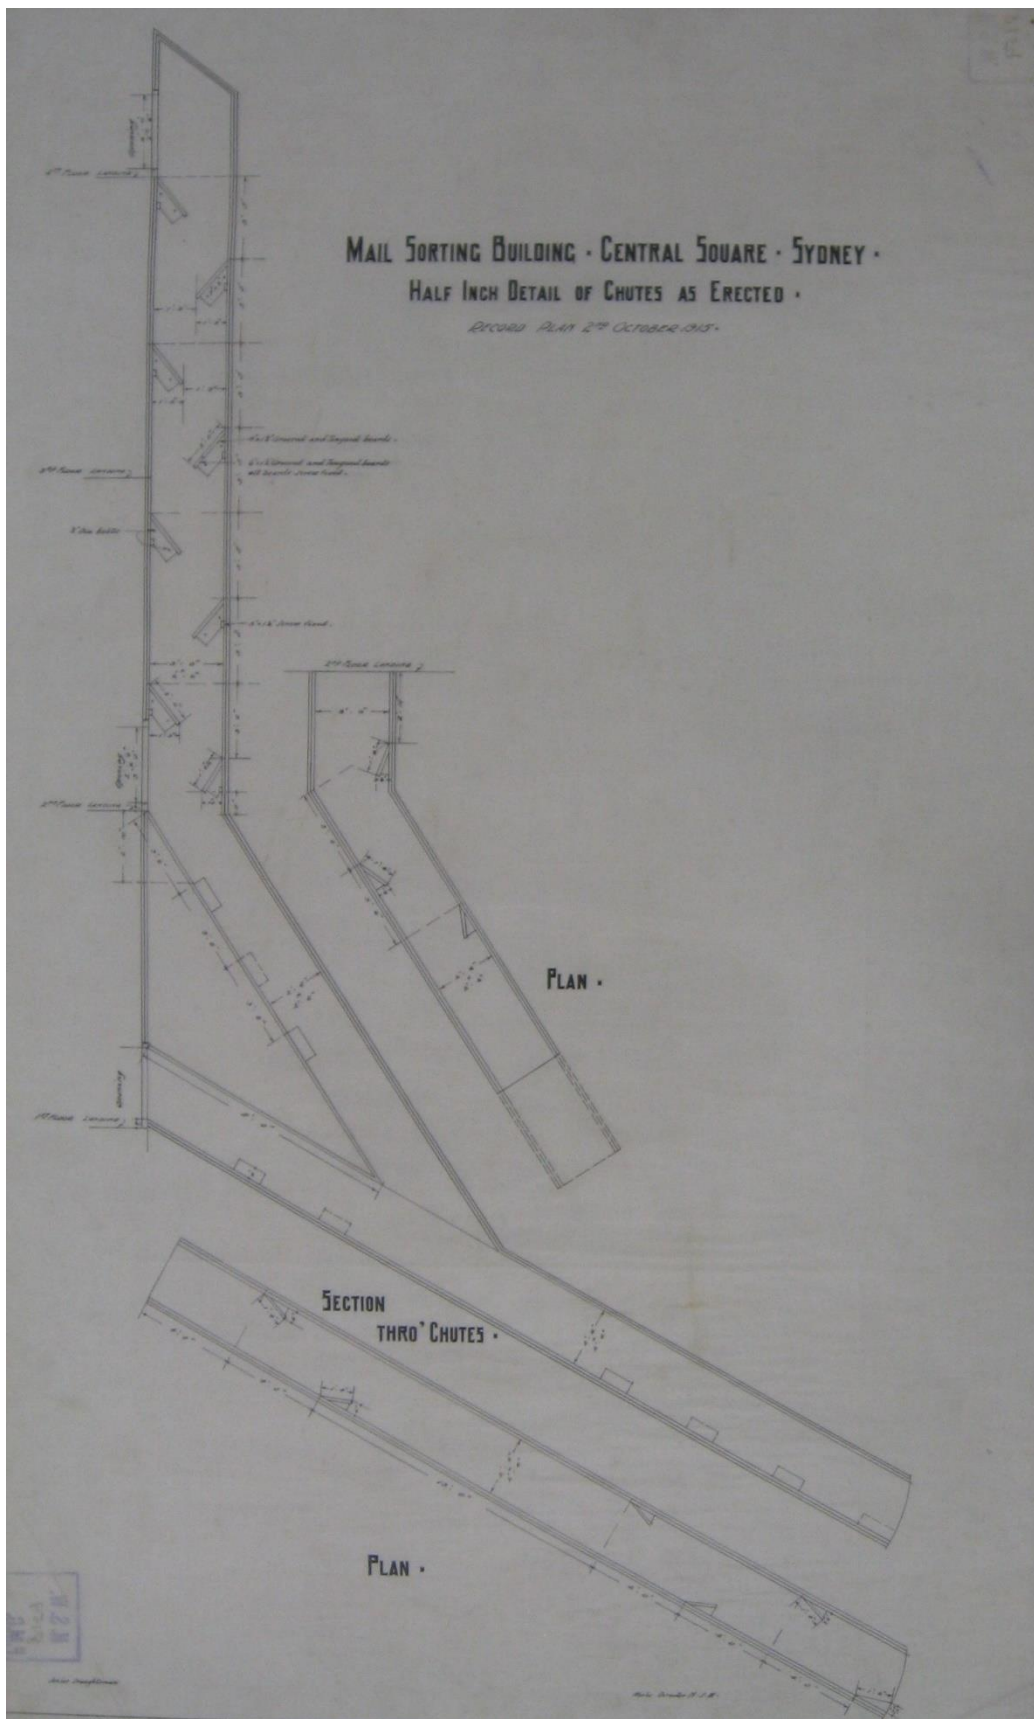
Detail of Mail Sorting Building Central Square Sydney, half inch detail of chutes as erected, 2/10/1915
